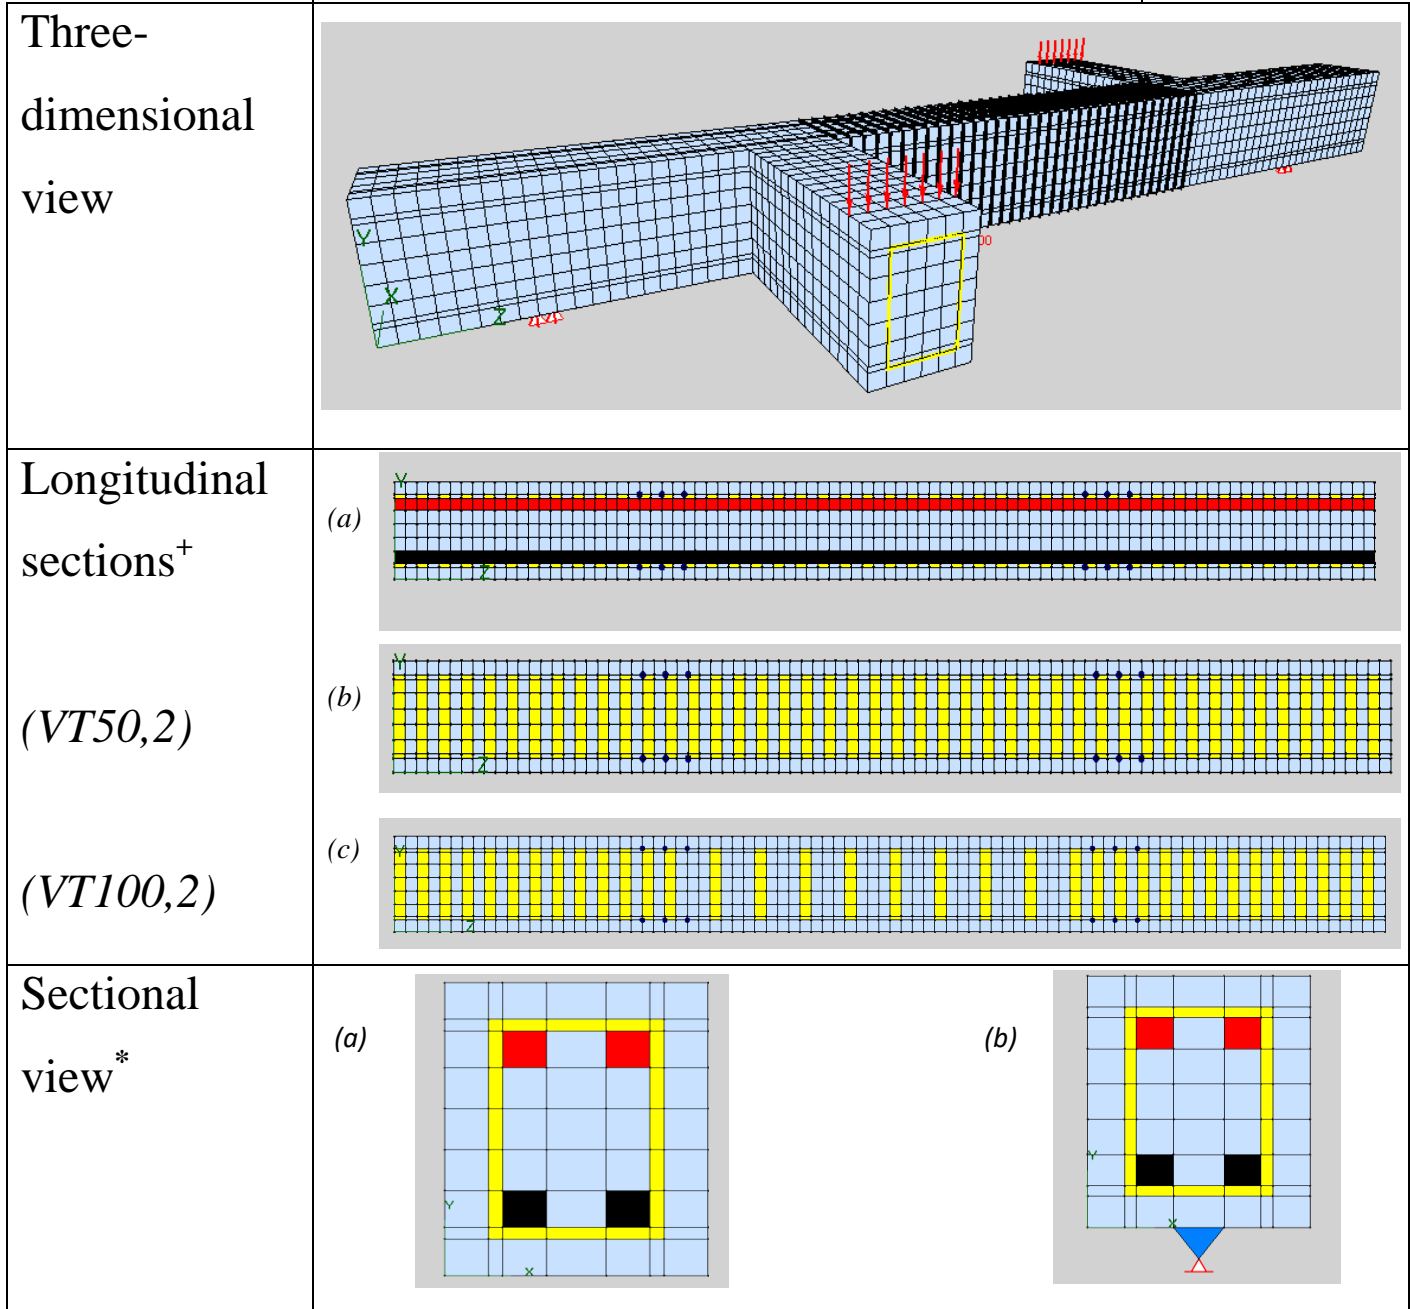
Sectional view for specimen VT50, 2 and VT100, 2
